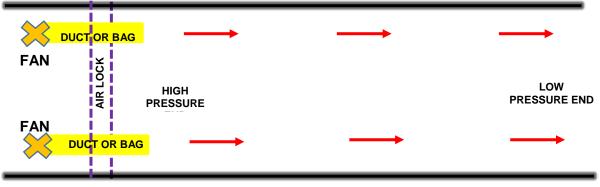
Example layout of a Longitudinal Ventilation System with Jet Fans
